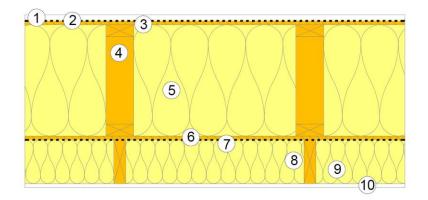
Wall section detail of the Pedler Residence home in plan view (Larsen truss).
